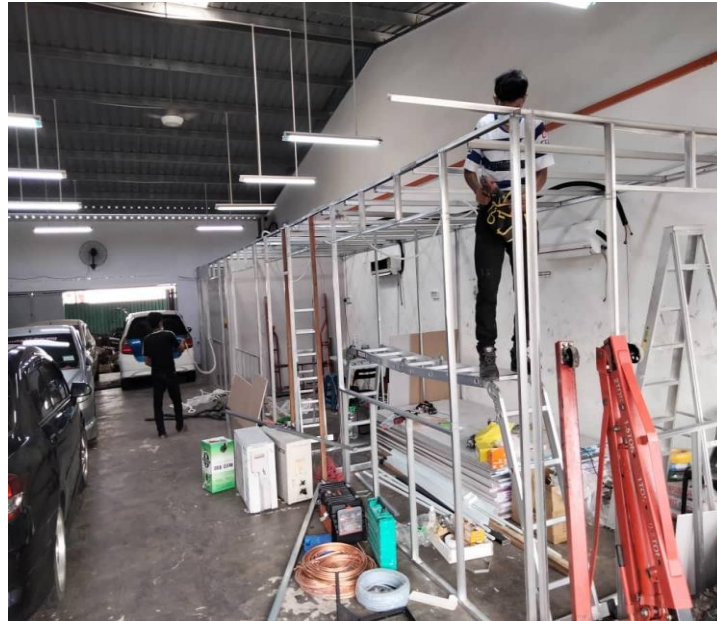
The construction of frame (metal stud) for partition wall (gypsum board)
